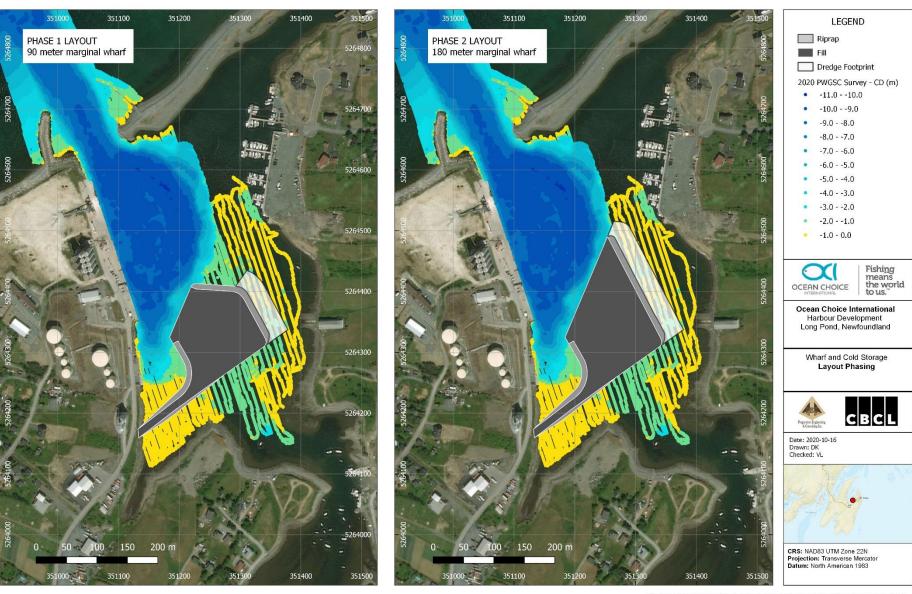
Proposed OCI Development Layout 1 and Layout 2
